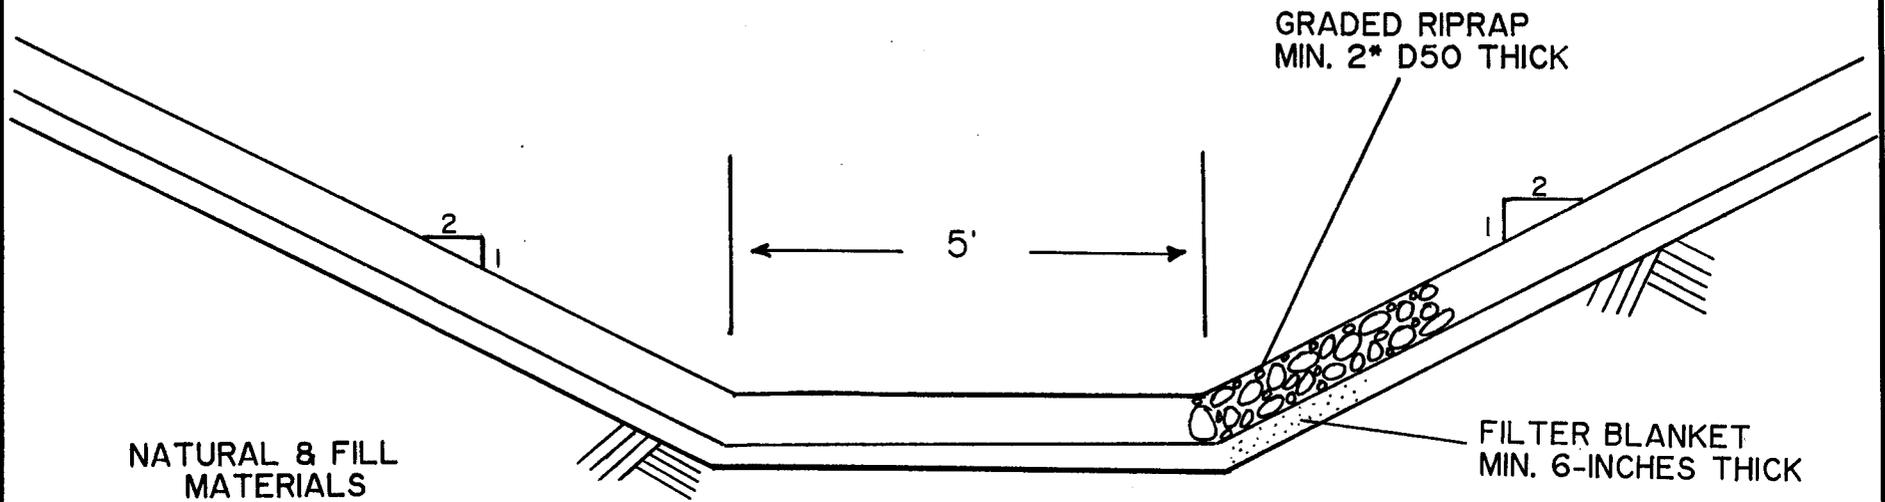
TYPICAL CROSS-SECTION FOR RECLAIMED CHANNELS.
